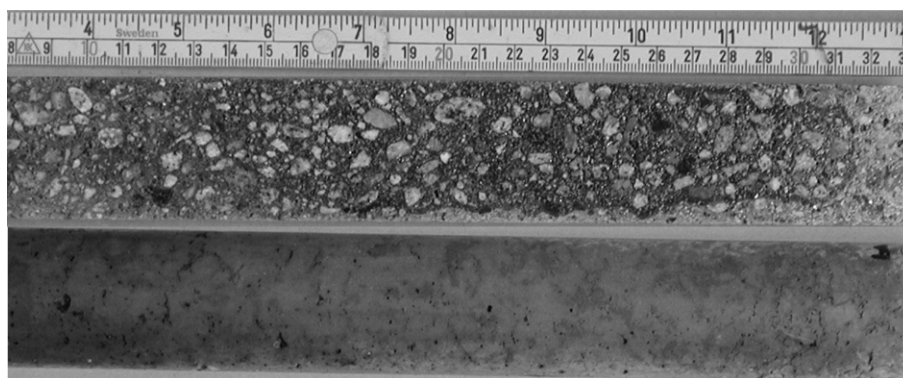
Flow profiles (upper) and pipe wall surface (lower) Mix 2 – steel, $v = 0.1$ m/s. (The hardened sample from Mix 2–rubber pipe–was damaged and not fit for further testing.)
